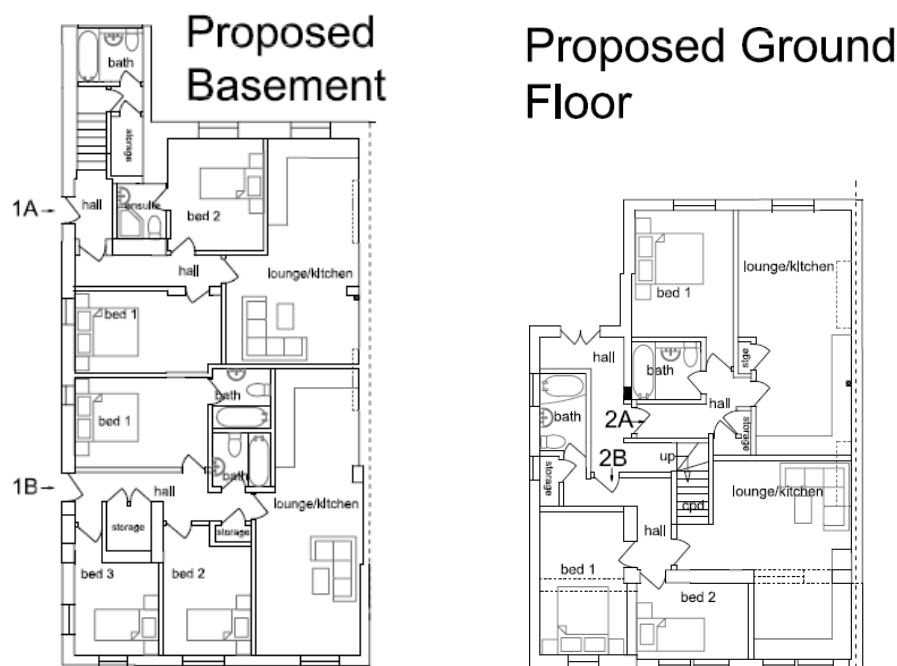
Proposed Basement and Ground Floor Plan showing layout of proposed flats 1A and 2A
